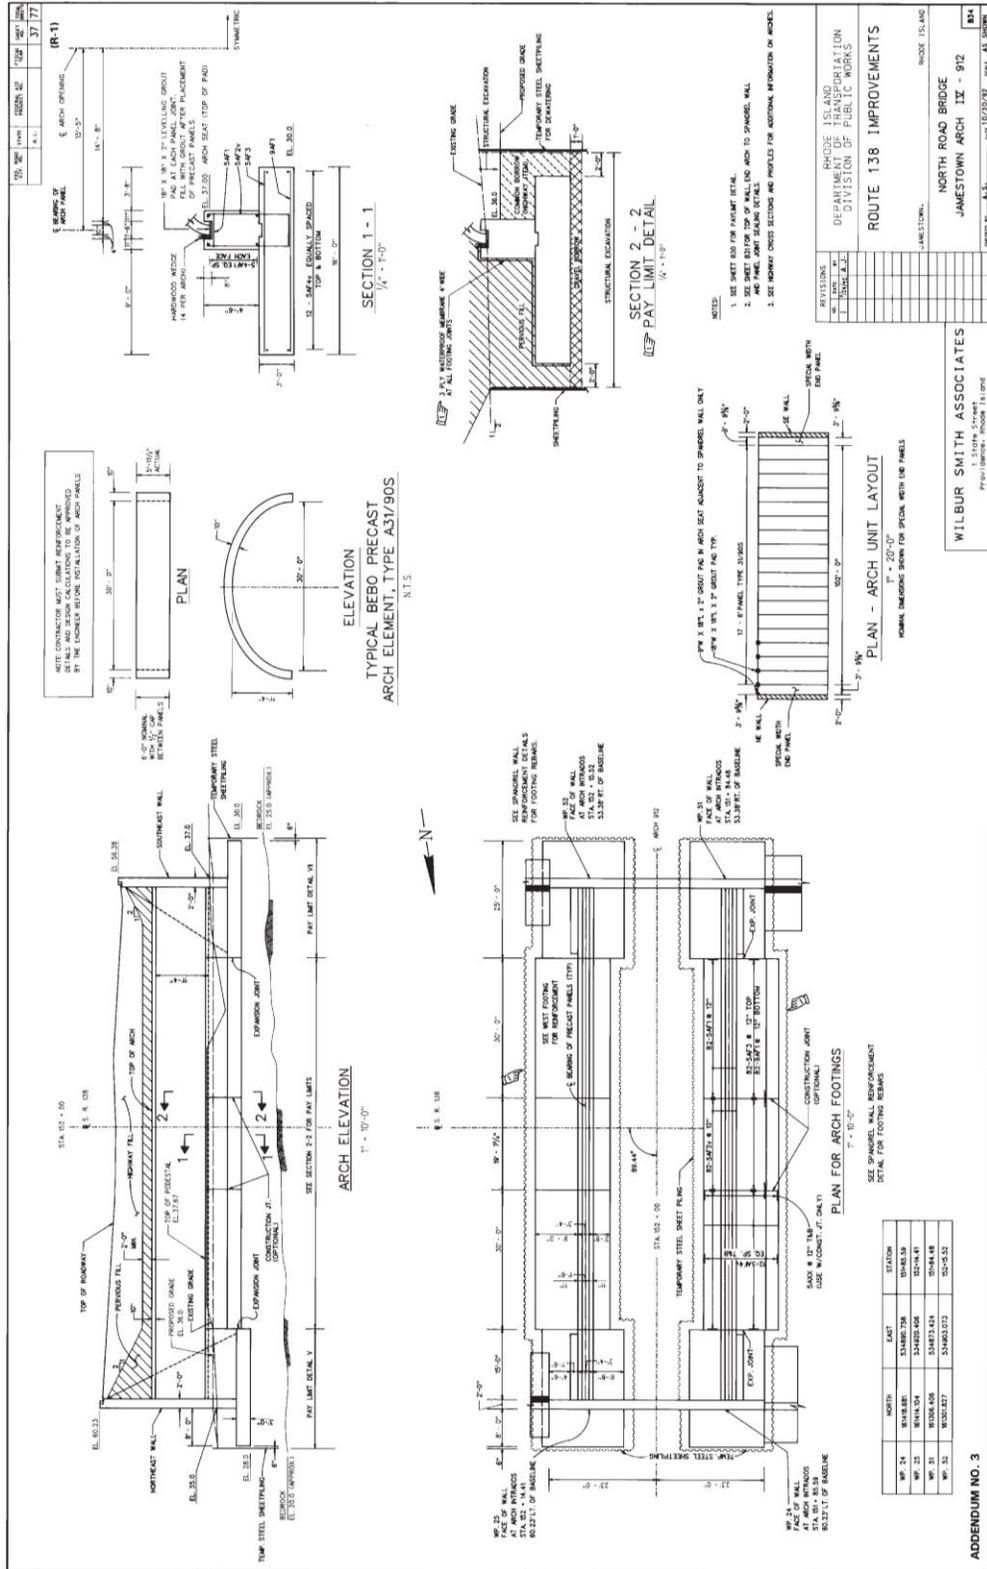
Arch IV Construction Plan II (provided by RIDOT)
